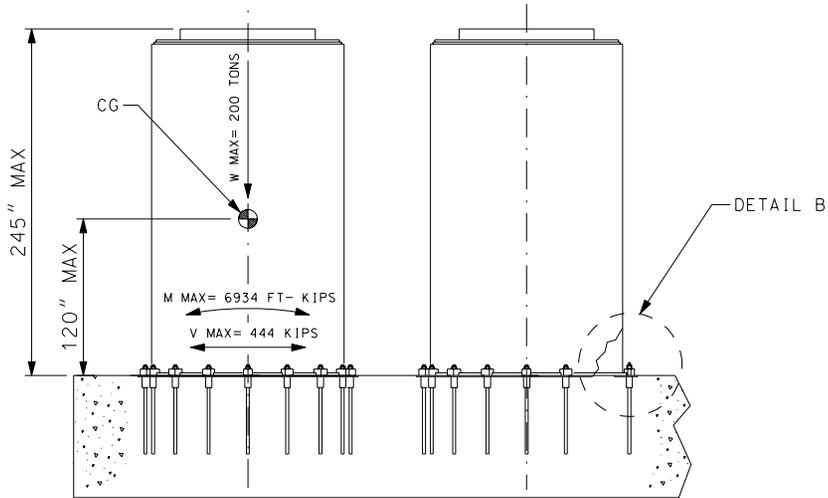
Typical Concrete Site-Specific Cask for CSNF in Canisters
